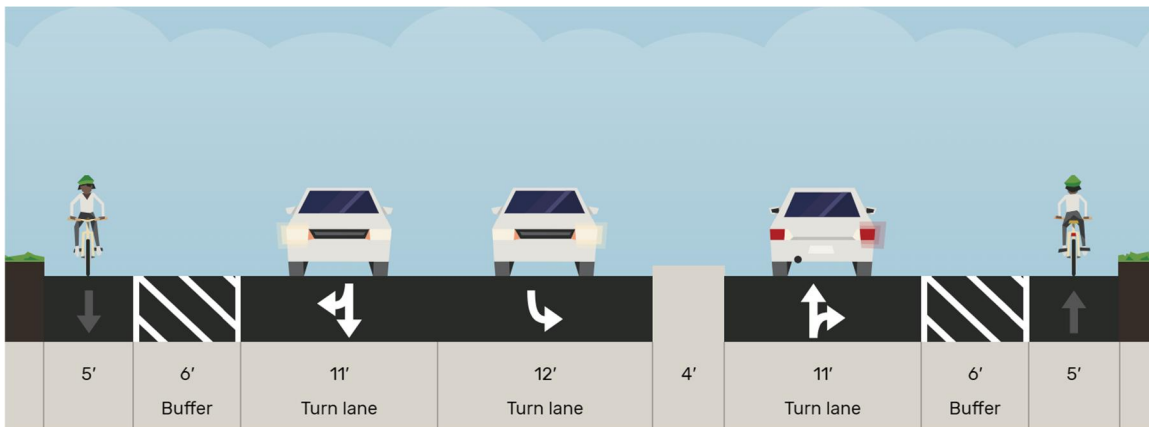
Huntington Avenue Build Conditions Typical Cross Section – With Median
